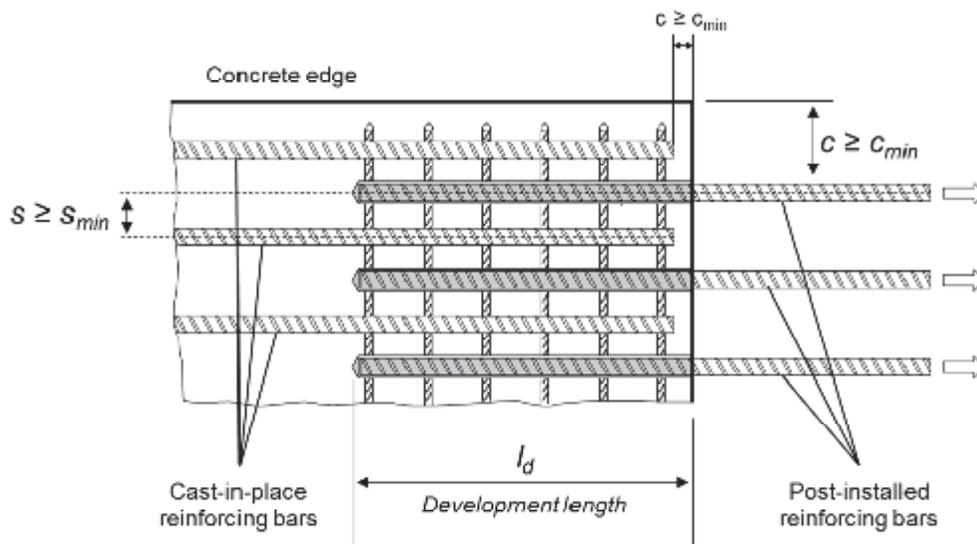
INSTALLATION PARAMETERS FOR POST-INSTALLED REINFORCING BARS
